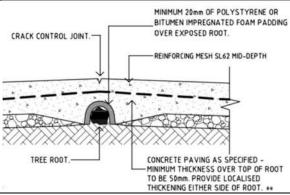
Image B: Example method for bridging concrete surfacing over tree roots provided in the Canterbury Bankstown Council standard drawings.⁹
